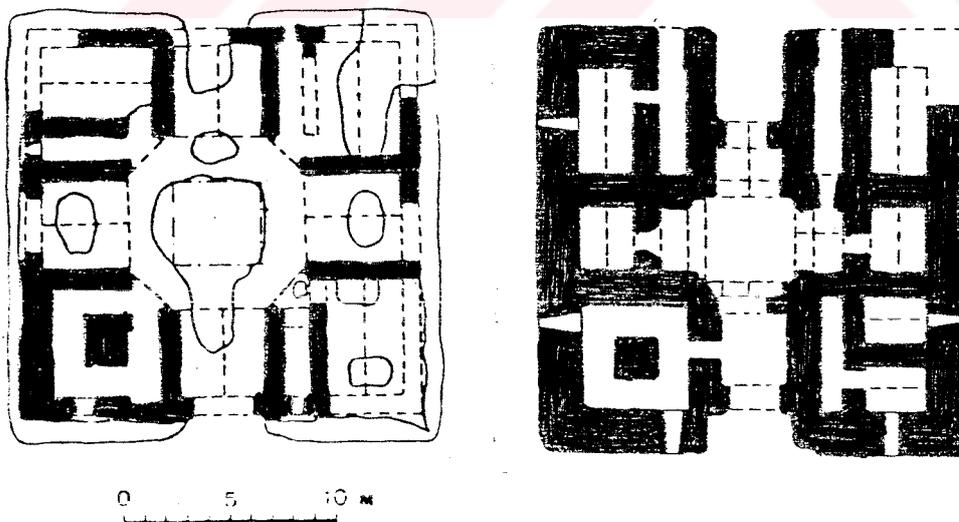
Two floor settlement of a house with storage in the ground floor
